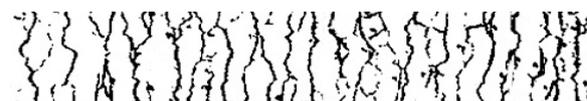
The cracks of beams step-processing with MATLAB.
